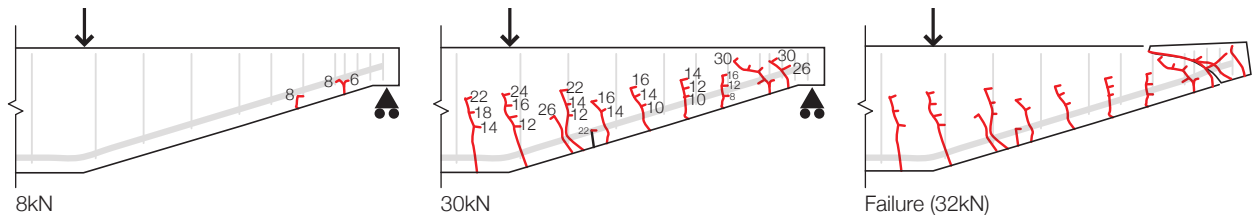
Progression of cracking in Beam 9\_2\_EC2\_M(ii).
